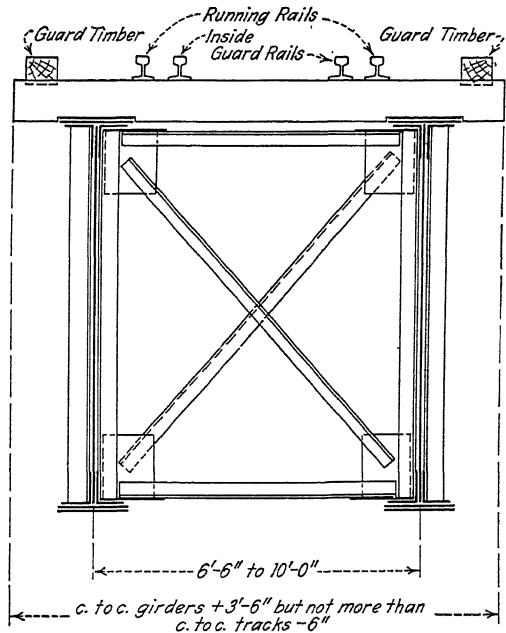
Cross-Section of Typical Railroad Girder-Bridge with Open Timber Deck.
